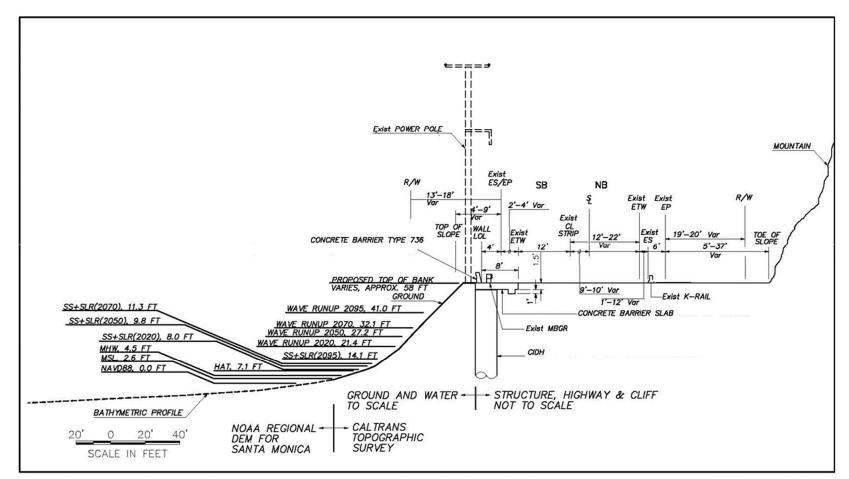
Cross section view of the proposed secant wall and applicable water levels at PM 4.0
